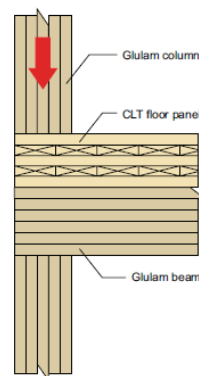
Example column and beam connection; beam bears directly on column with beam shrinkage accumulation sub-optimal
